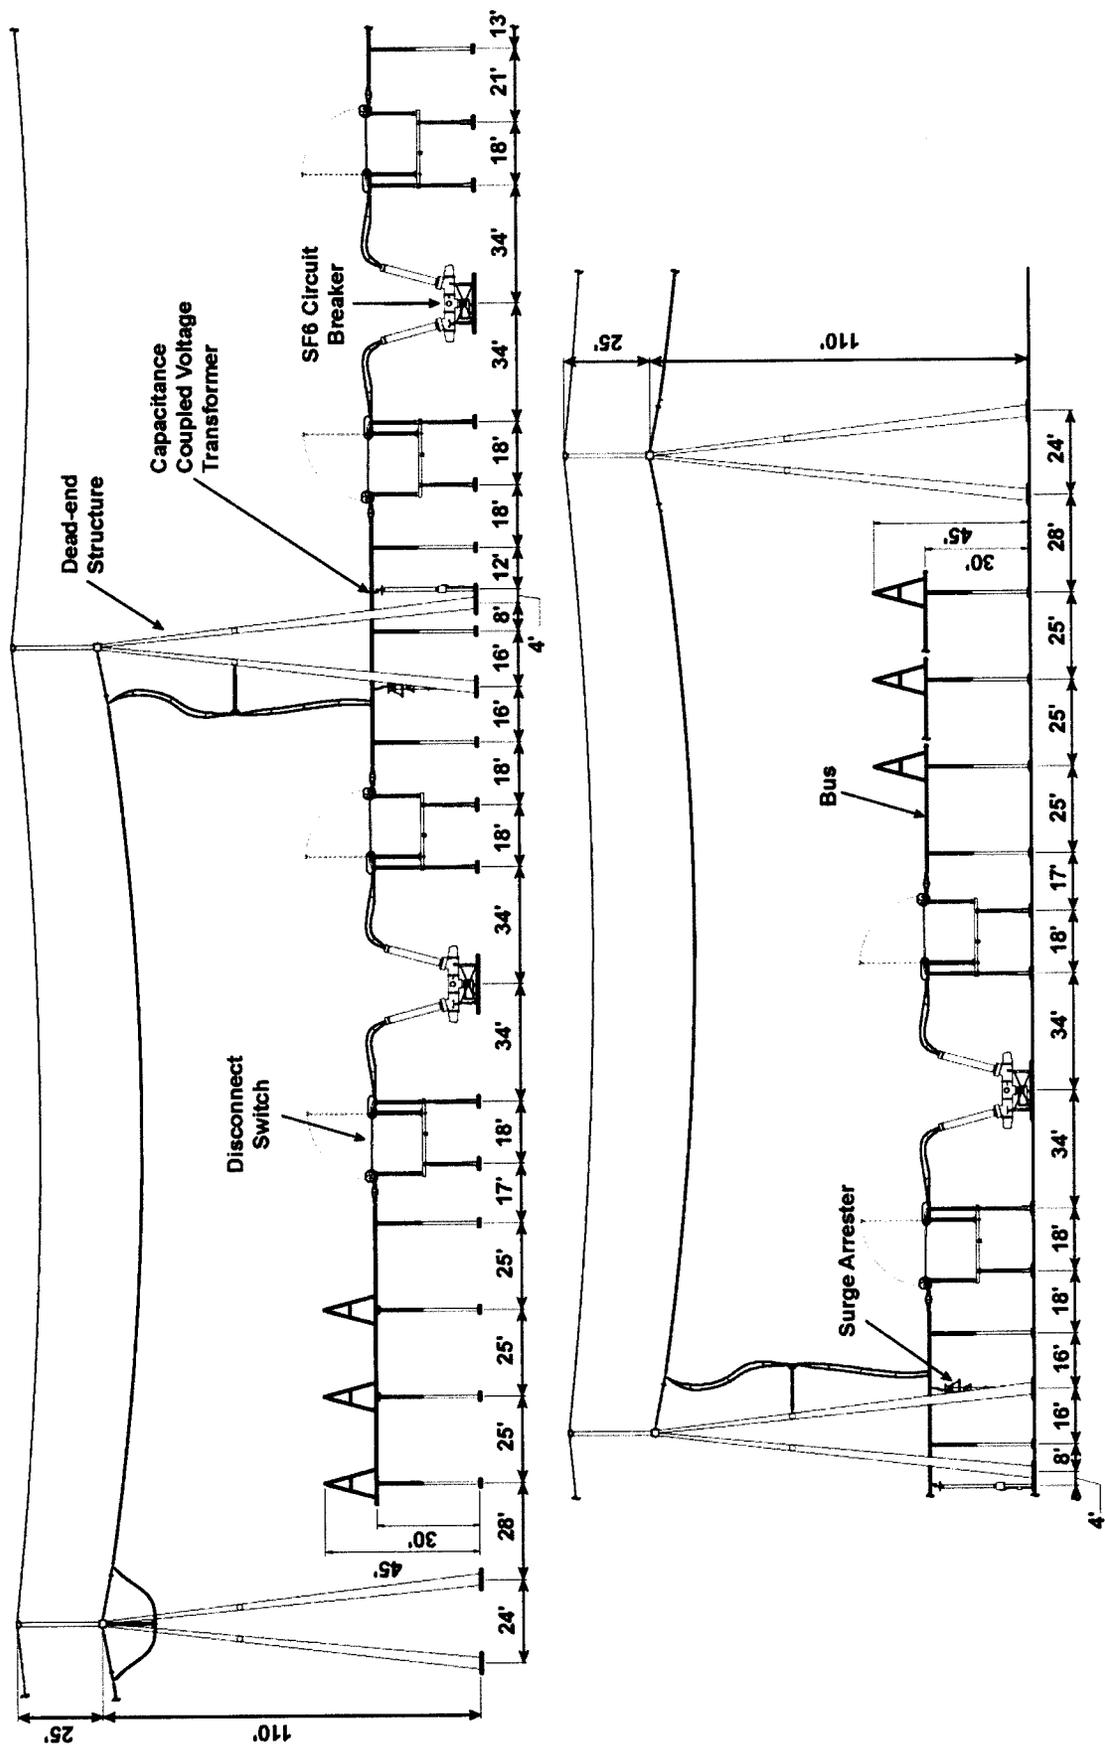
Typical 500 kV Substation Schematic – Elevation View
